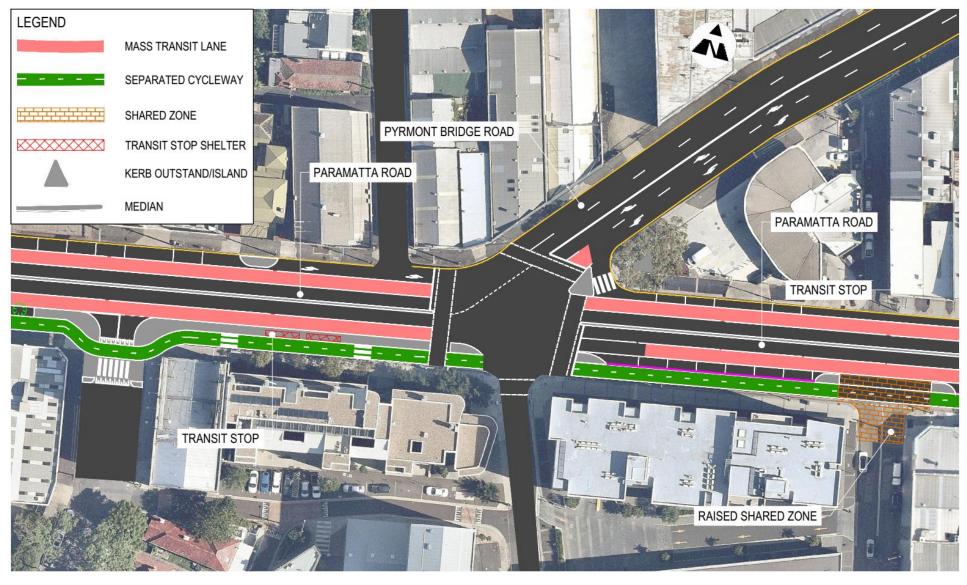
Parramatta Road space reallocation concept – Pyrmont Bridge Road
